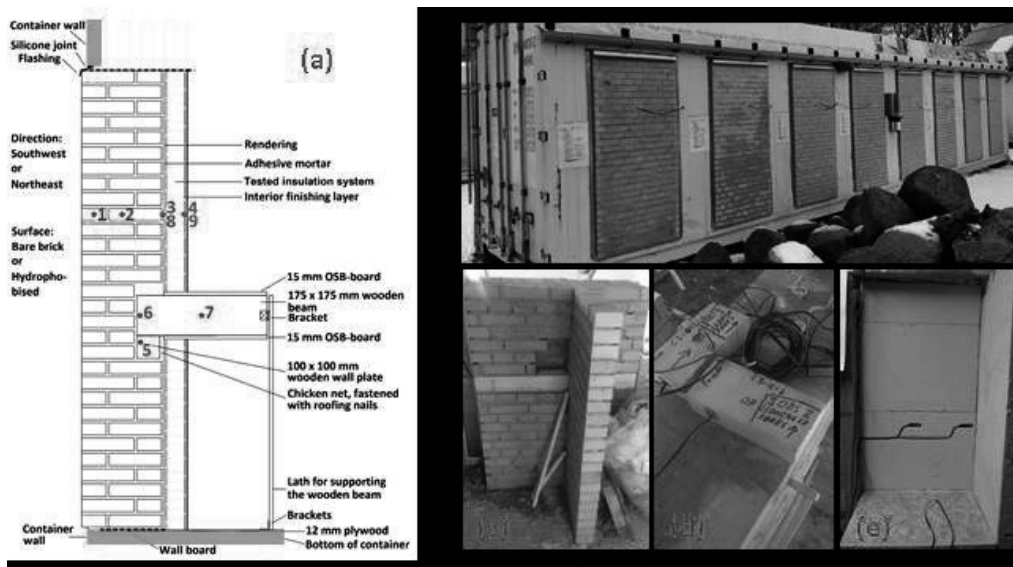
Test stand configuration: (a) Vertical section of a test wall, (b) External view of test container, (c) Test wall under construction with wooden wall plate and hole for beam end, (d) Sensor installation in bricks (sensor points 1 and 2), (e) Sensor installation in insulation near interior surface (sensor points 4 and 9).
